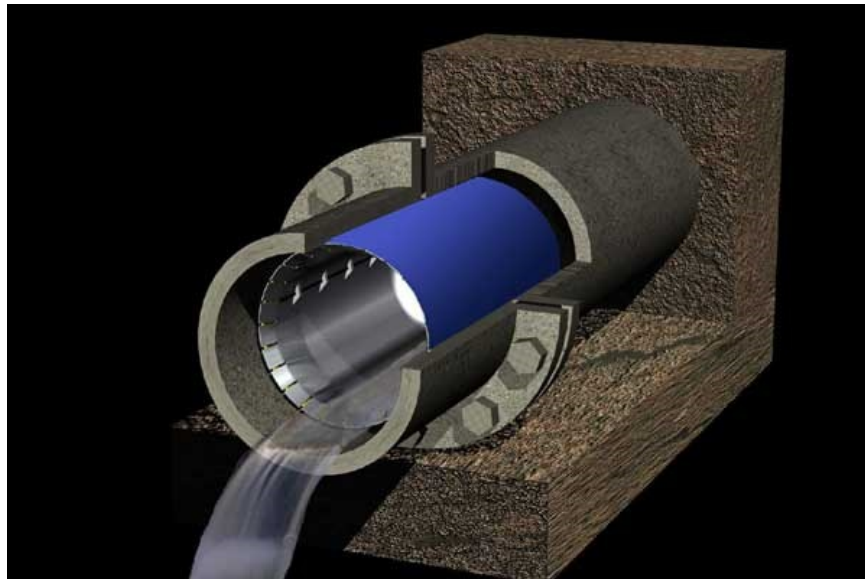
Cross Section of Stainless Steel Pipe Sleeve (www.linkpipe.com)
